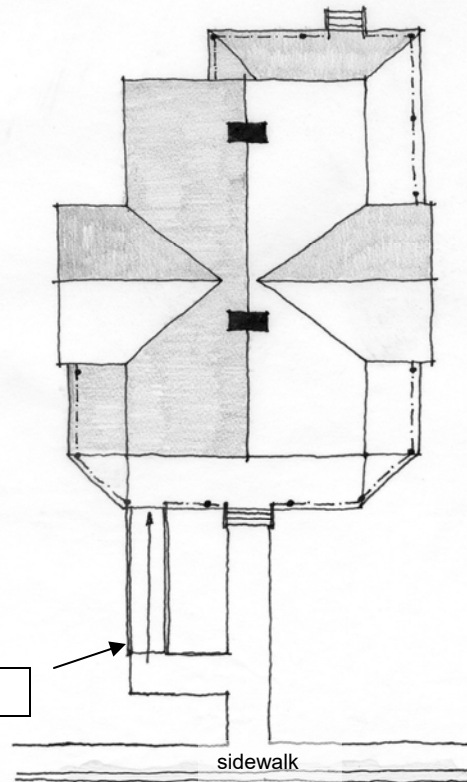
Handicap ramps should be placed on the side or rear rather than on the front of buildings.
